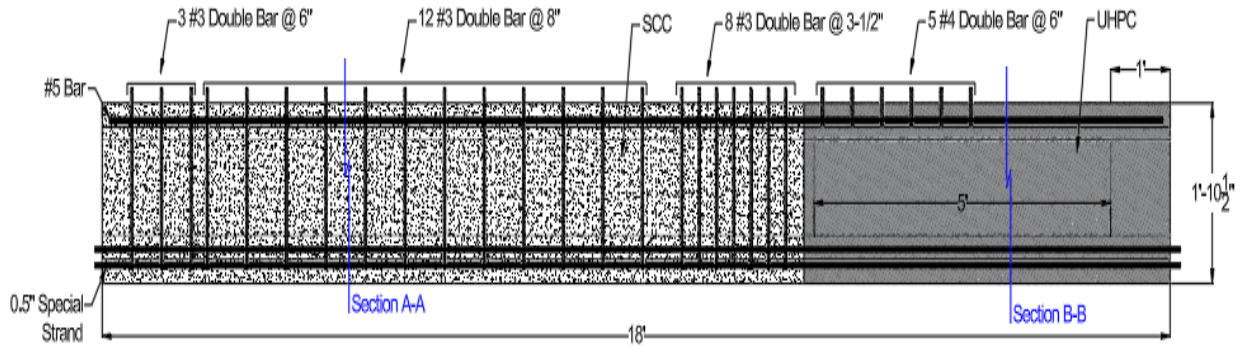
Elevation view of full UHPC prestressed girder specimen
